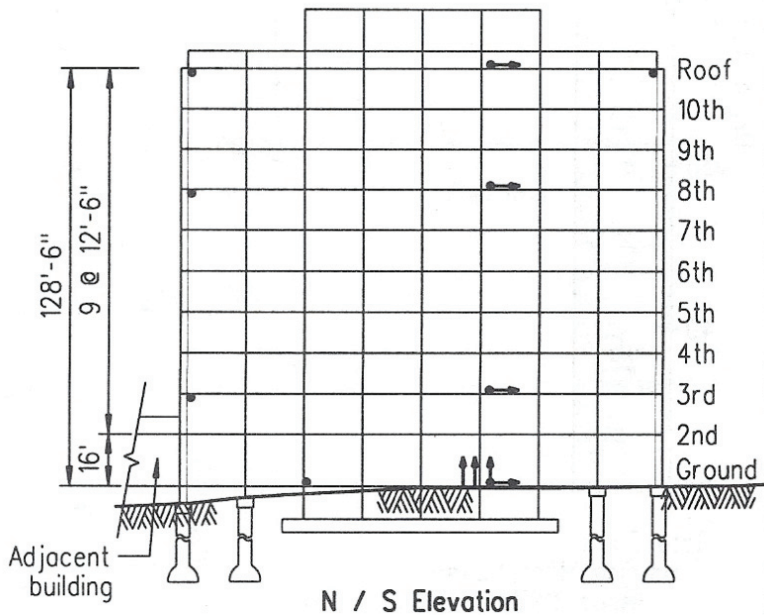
Walnut Creek building longitudinal elevation, based on construction drawings provided by CSMIP (Stewart and Stewart, 1997, with permission).
